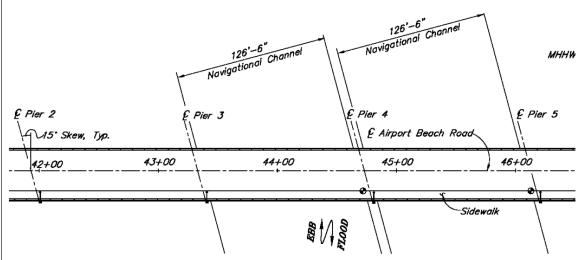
Bridge plan view indicating navigation channel width dimensions. (Source: Alaska DOT)
